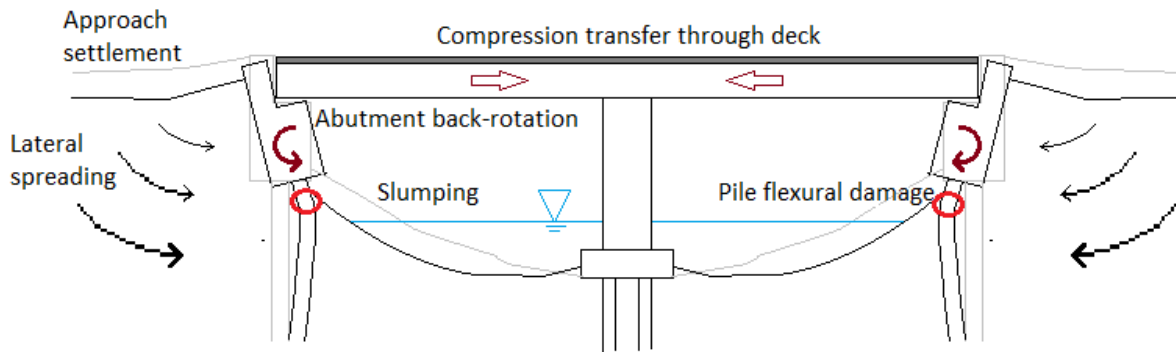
Diagram showing the characteristic lateral spreading-induced bridge damage mechanism to short-span bridges; deck-pinning, abutment back-rotation, abutment pile damage, slumping and spreading of approaches
